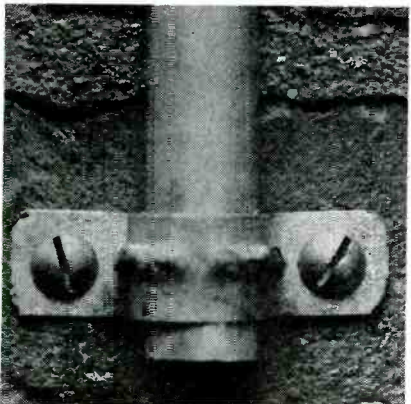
Mast clamp which supports antenna pipe. This is fastened on two sides with 1/4" brass screws which fit into the threaded insert of the lead expansion fitting.
